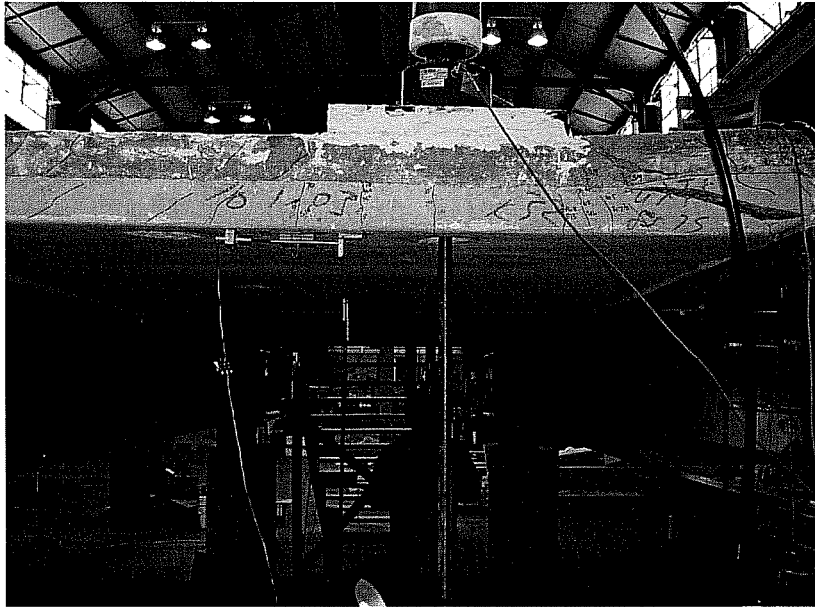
Interior bay failure surface at bottom of slab, facing east
